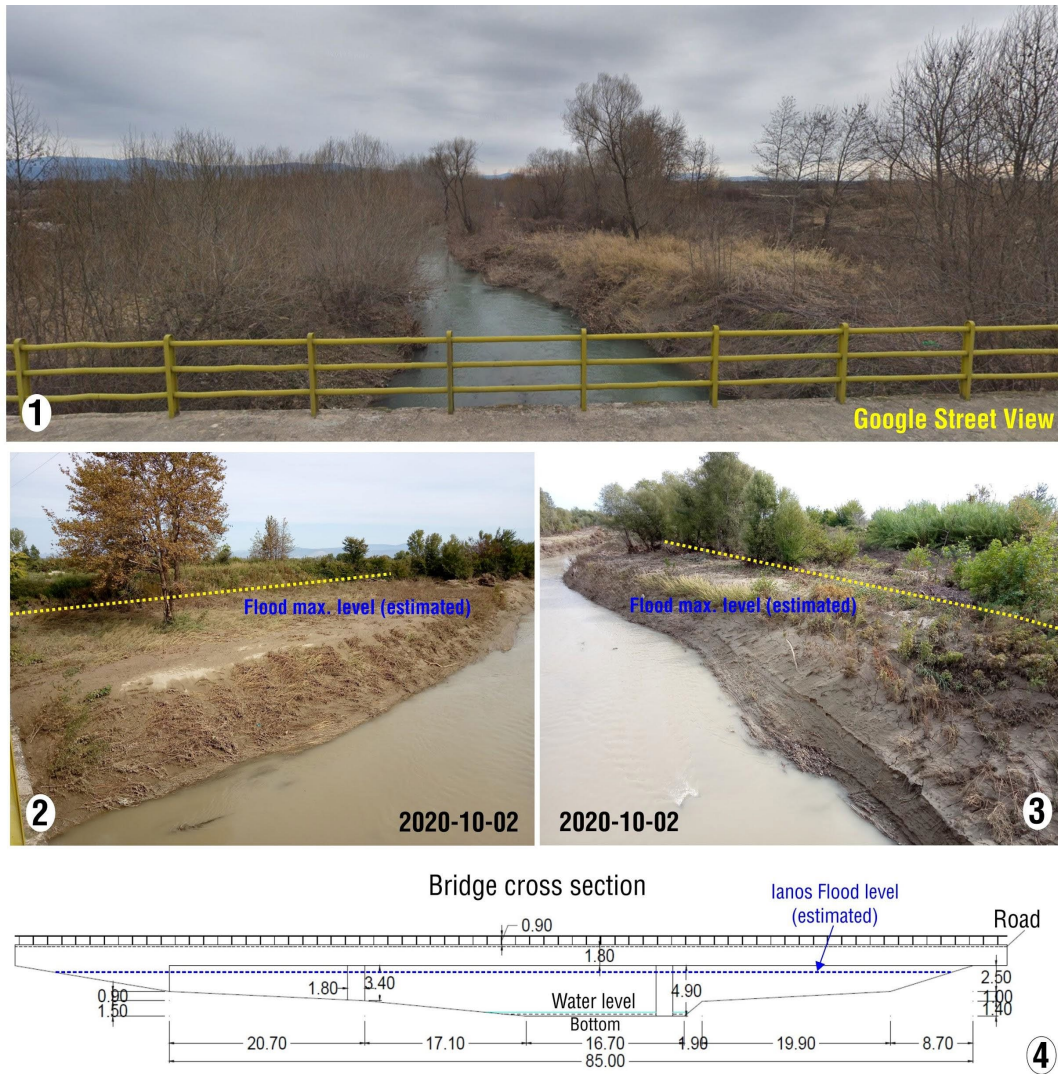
Road bridge over Pamisos canal, view to the east - downstream (39.46341°N, 21.79944°E). Field photos (2,3) compared with pre-event Google Street View image (1) and technical cross section. Maximum flood level did not overtop the bridge, but is estimated close to ~4 meters from the bottom.
